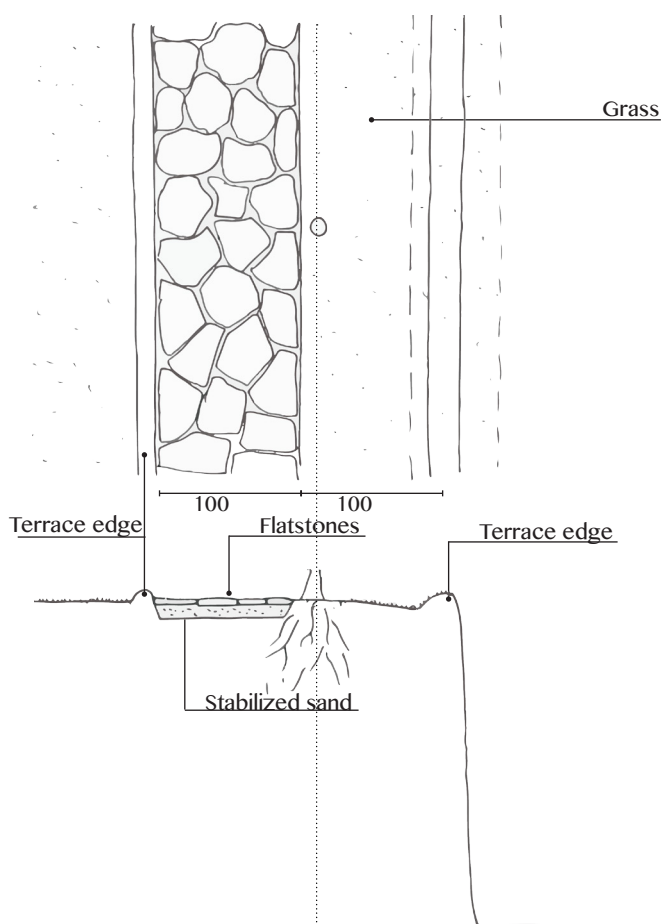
Detail G1 Typical detail of road phase 1, Scale 1:50, dimensions in cm
